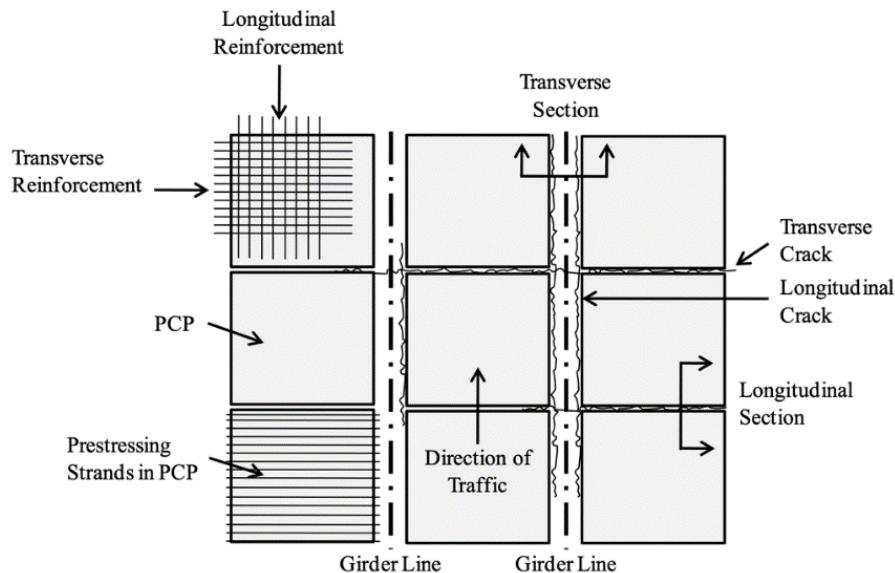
CIP-PCP Bridge Deck Terminology (Foster, 2010)
